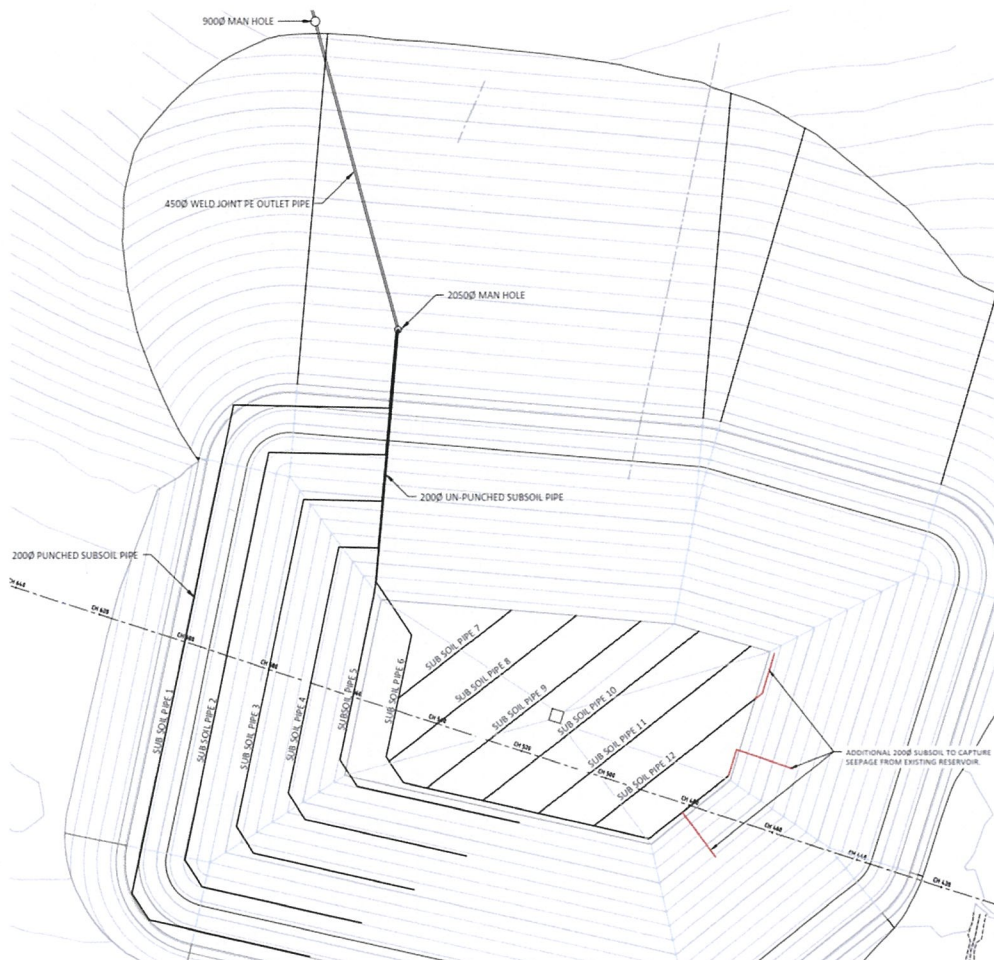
Subsoil drainage network underlying HDPE and clay liner
